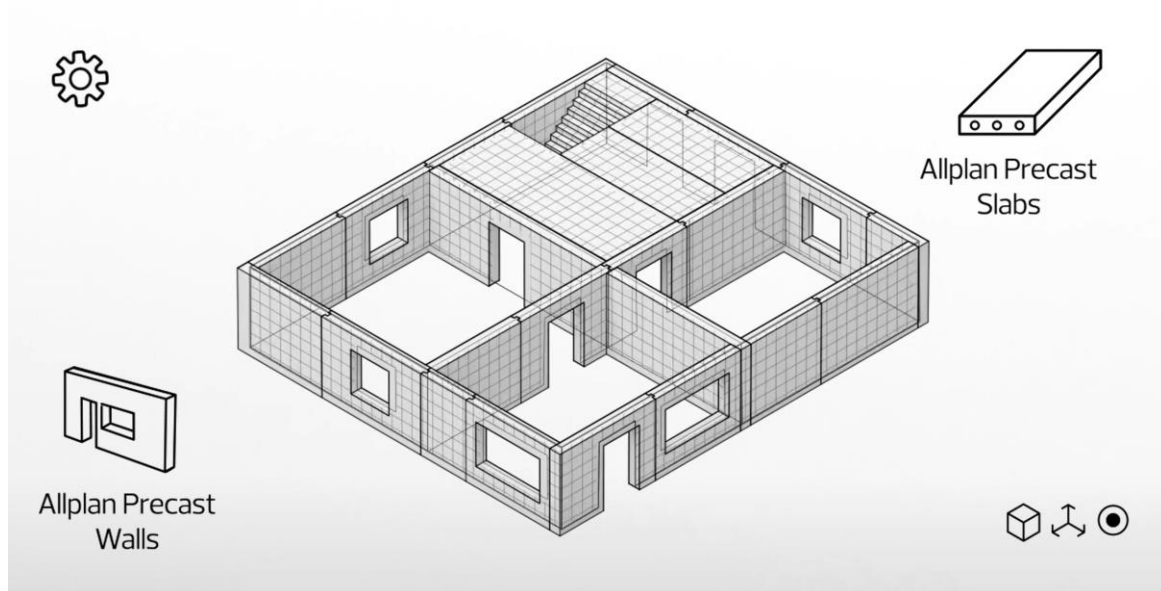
Allplan precast slabs, by Allplan, <https://www.allplan.com/products/allplan-precast/>. Copyright by ALLPLAN Deutschland GmbH ALLPLAN is part of the Nemetschek Group.
